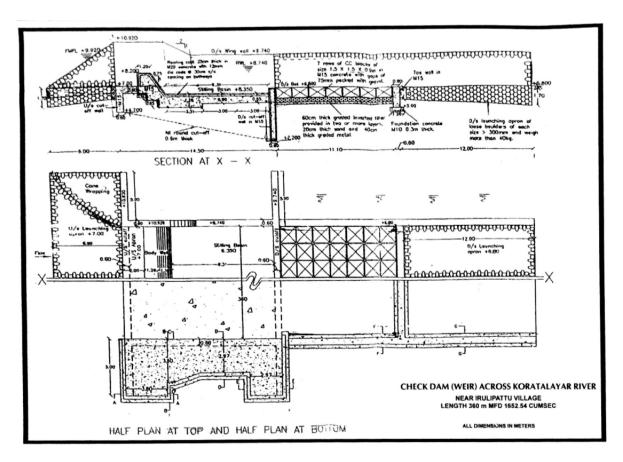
Check dam at Irulipattu – Detailed drawing (from Public Works Department, GoTN).
